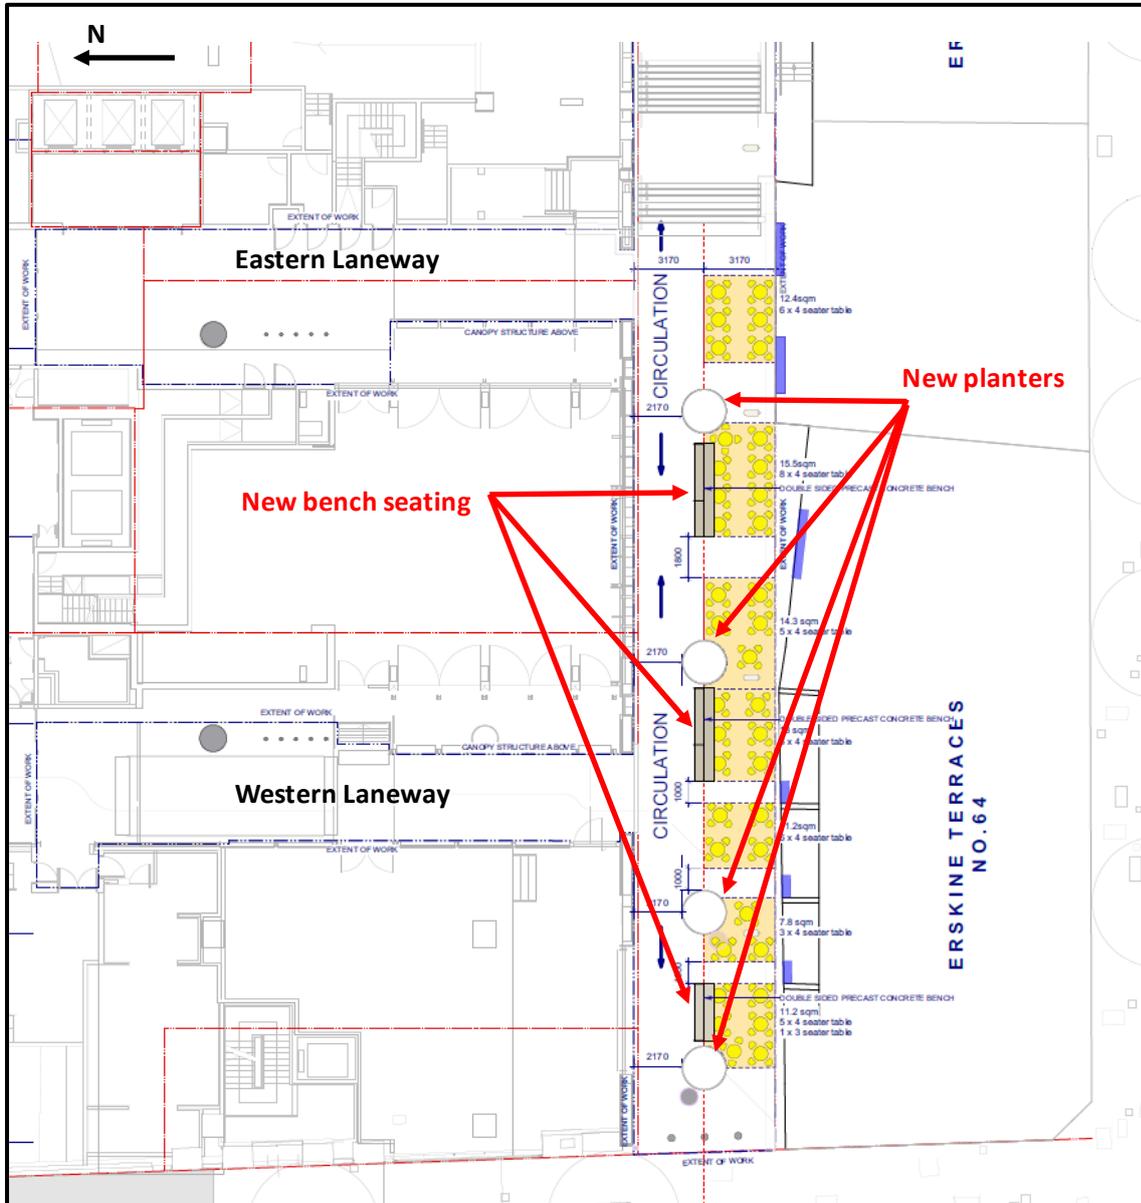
Proposed planters and seating adjacent to outdoor seating areas in Sussex Lane - not supported.
